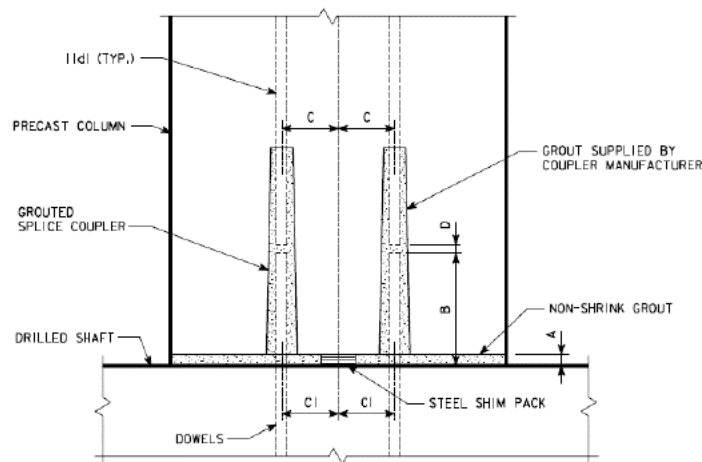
Precast column-to-footing connection in Keg Creek Bridge (Littleton 2013)
